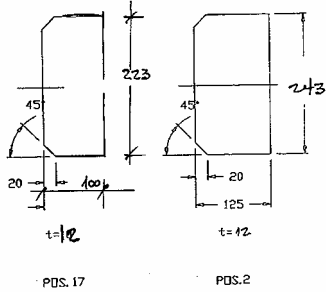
K-bracing and shear-link: detail of Pos. 17 and Pos. 2
